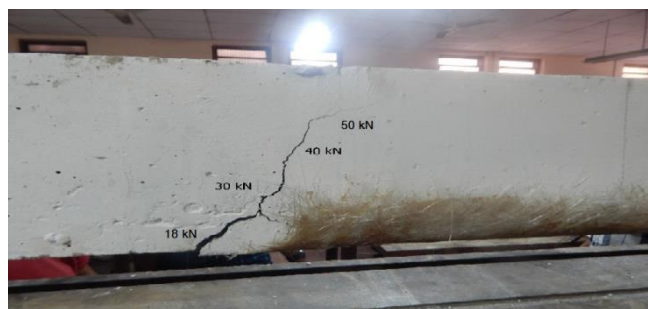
Flexural cracks for bottom wrapped layered specimen (B3)
